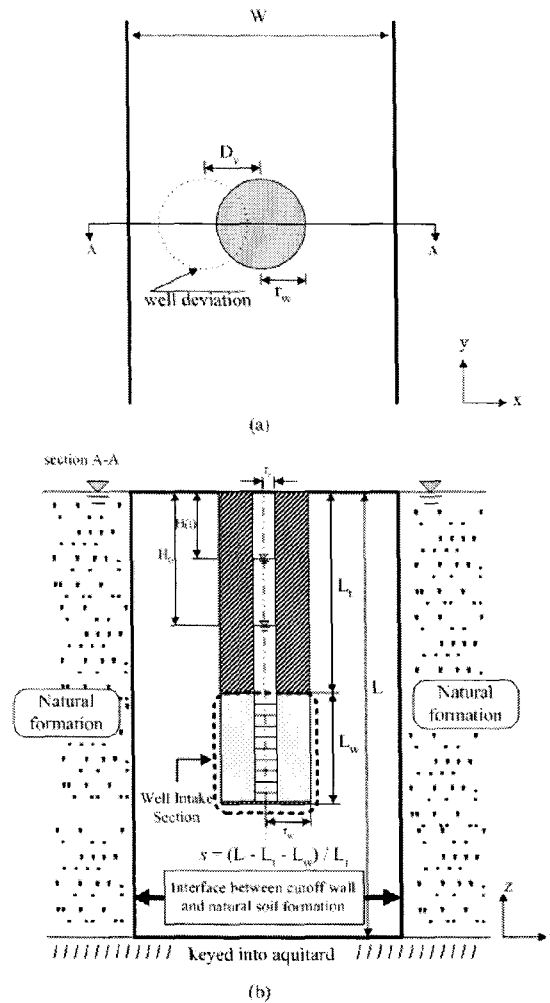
Slug test configuration in vertical cutoff wall: (a) Plan view; (b) Vertical cross section A-A
